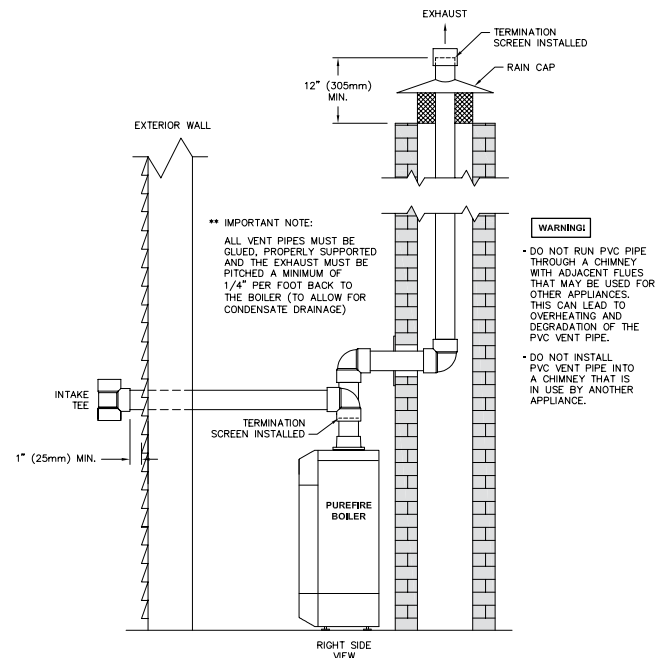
Venting Through A Chimney Using Sidewall Outside Air
